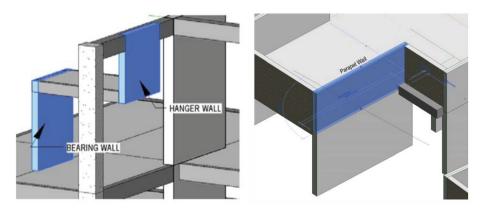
Precast hanger wall (left) and precast parapet wall (right) in a typical high-rise housing block of Hong Kong (Source: [38])
